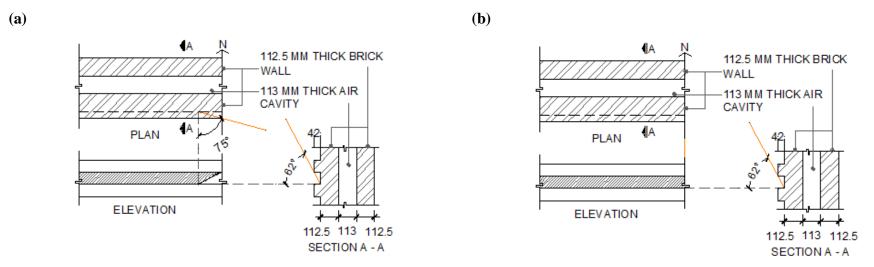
Shaded wall area for one brick course of south wall on 23rd March (a) At 0800/1600 hours (b) At 1200 hours
